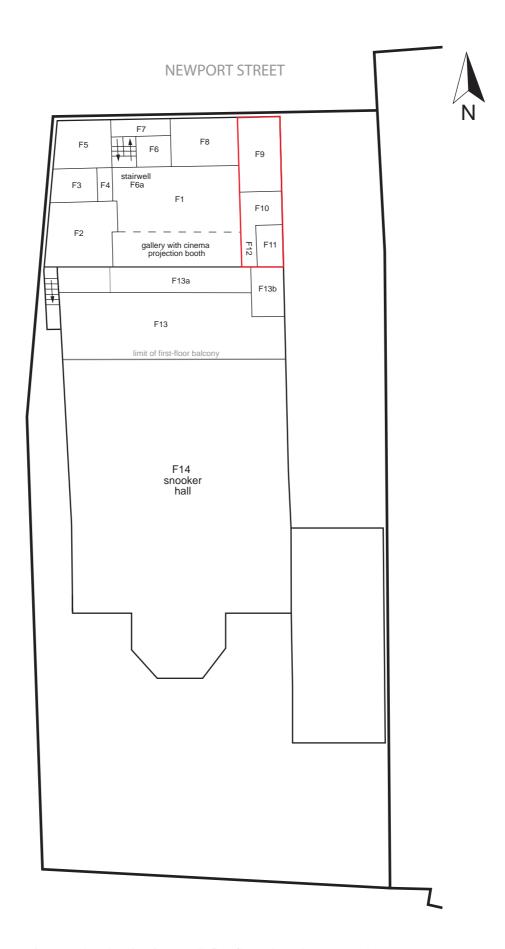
The Electric Bingo Hall, first floor plan (nb. not to scale).
